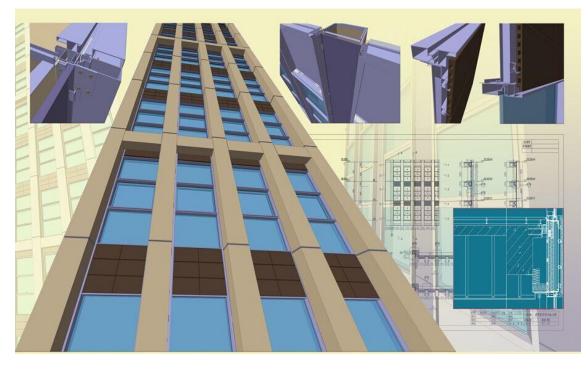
Curtain Wall Joints of CABR Research Building (Source: CABRTECH BIM Team)
